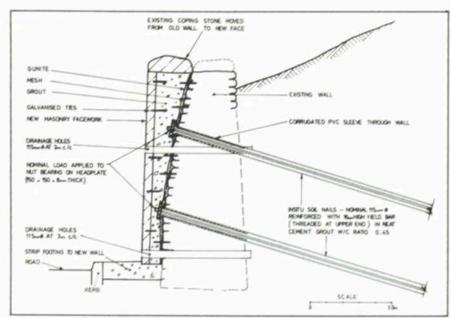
Typical Section of Repaired Wall (including backfill behind rebuilt section), Denholme Clough
